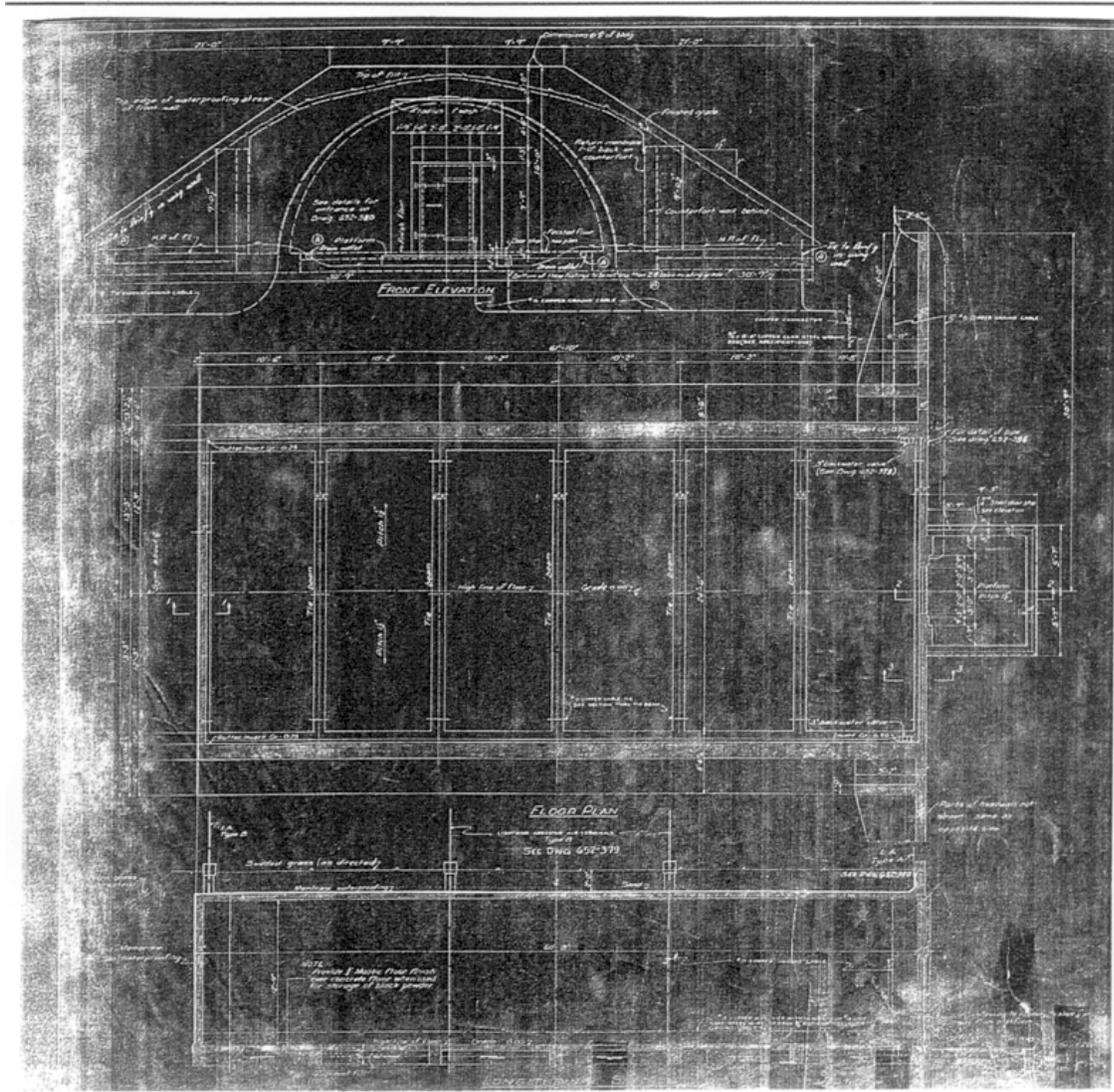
Floor plan and front elevation for underground magazine, Drawing 652-383.
